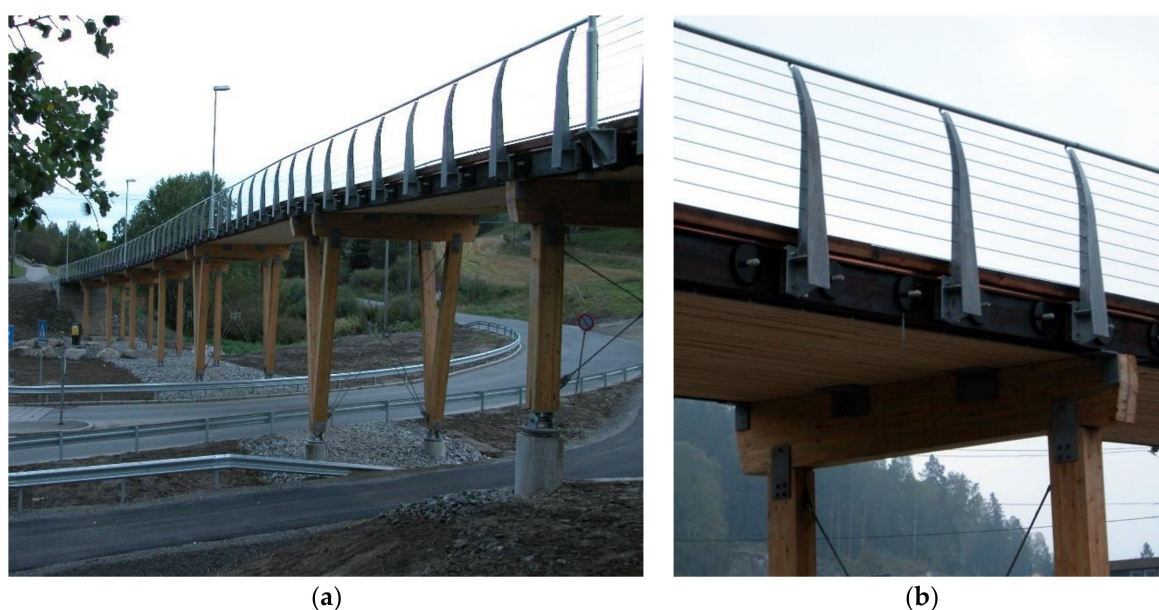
Sørliveien Bridge. (a) Side view of the whole bridge structure. (b) Detail of the stress-laminated timber (SLT) deck protecting the bridge.
